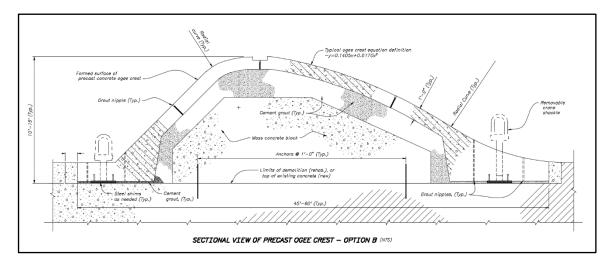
Showing Precast Concrete Ogee Crest, Option B, Concrete Blocks and Cement Grout
